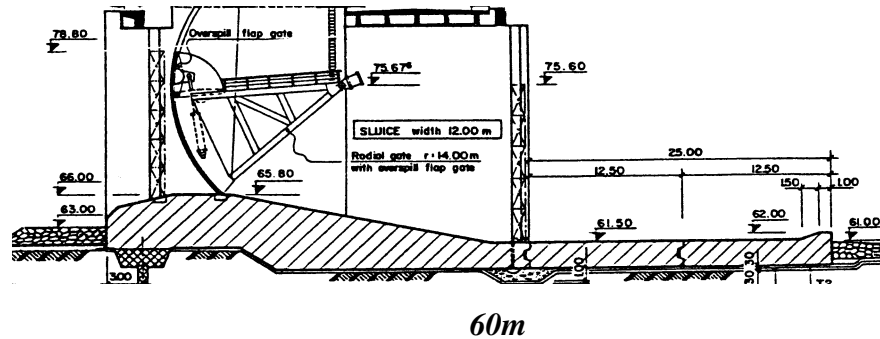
Longitudinal Section of the New Esna Spillway Stilling Basin, Sogreah 1984
